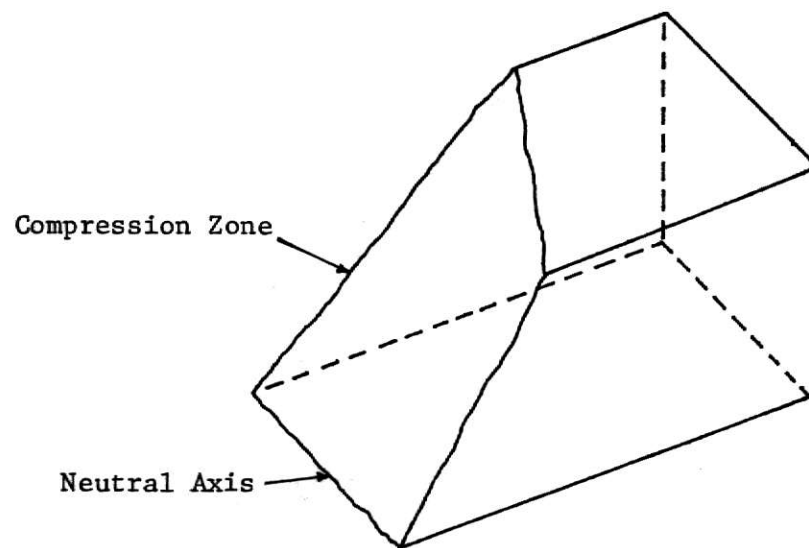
Skewed Bending Failure of Rectangular Section Subject to Pure Torsion
